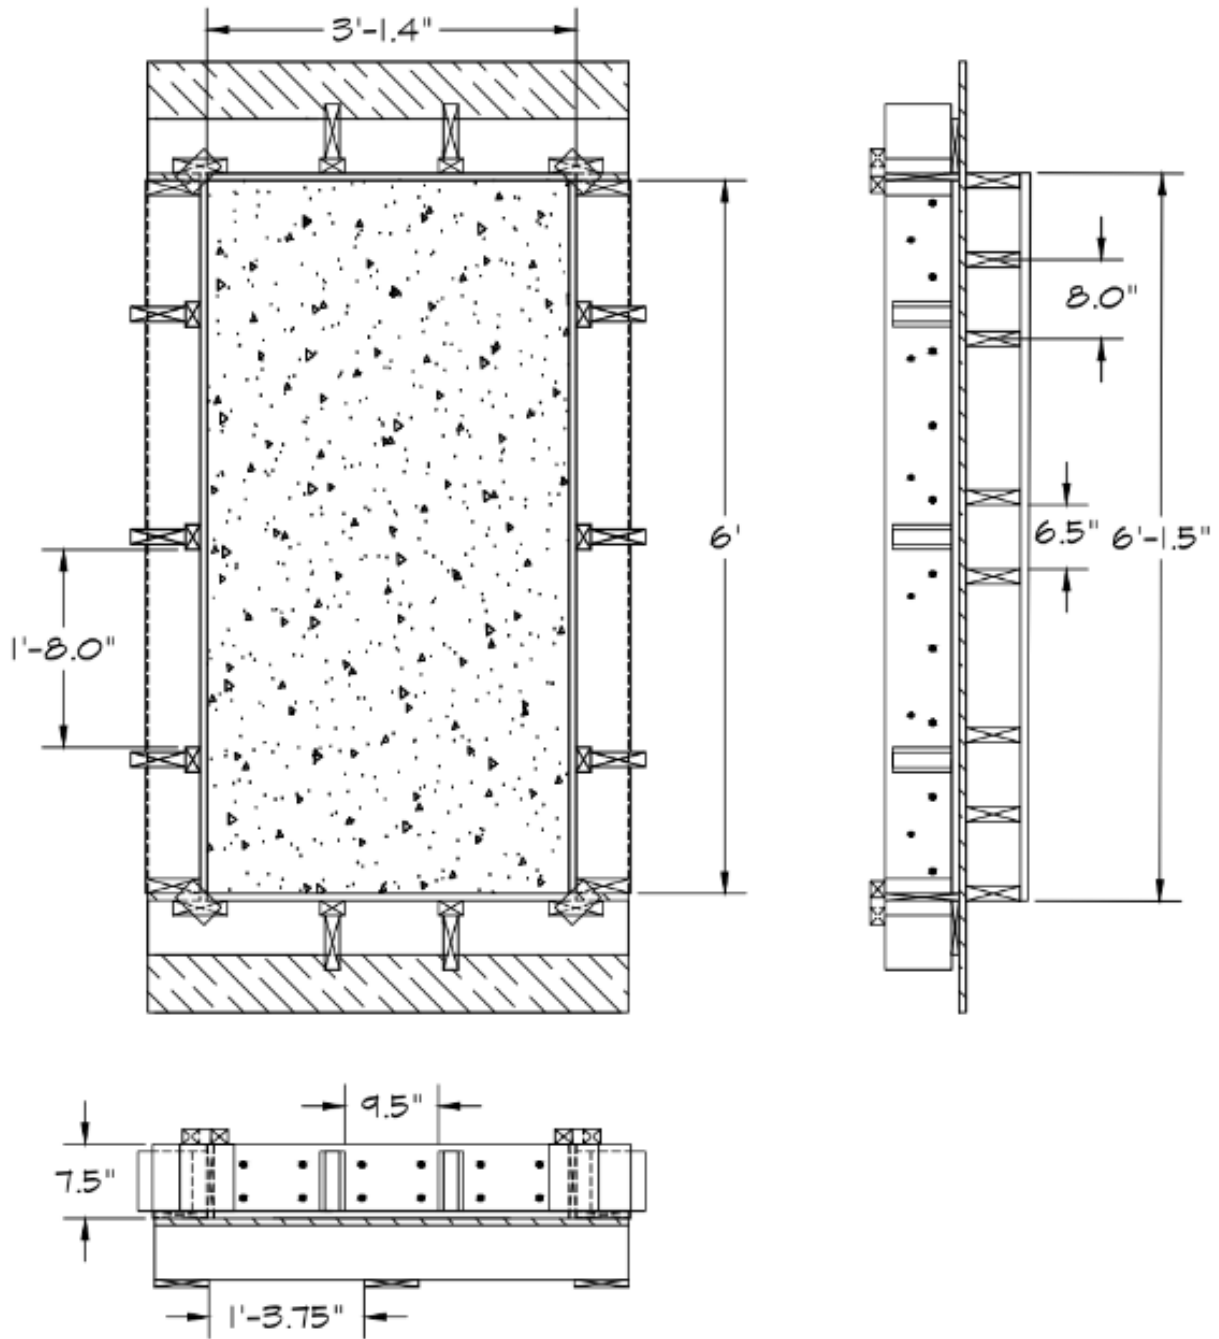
Formwork and dimensions of the mini-bridge deck substrates (Guerrero-Estrada, 2024)
